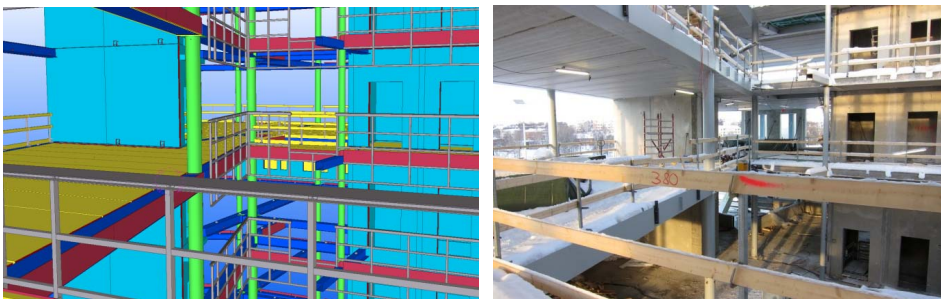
Comparing model and live situation: General view of falling prevention in the office floors around the atrium.
